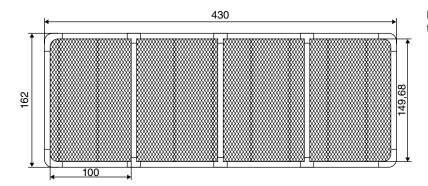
Plan of a bio-floating bed framework (unit: cm).
